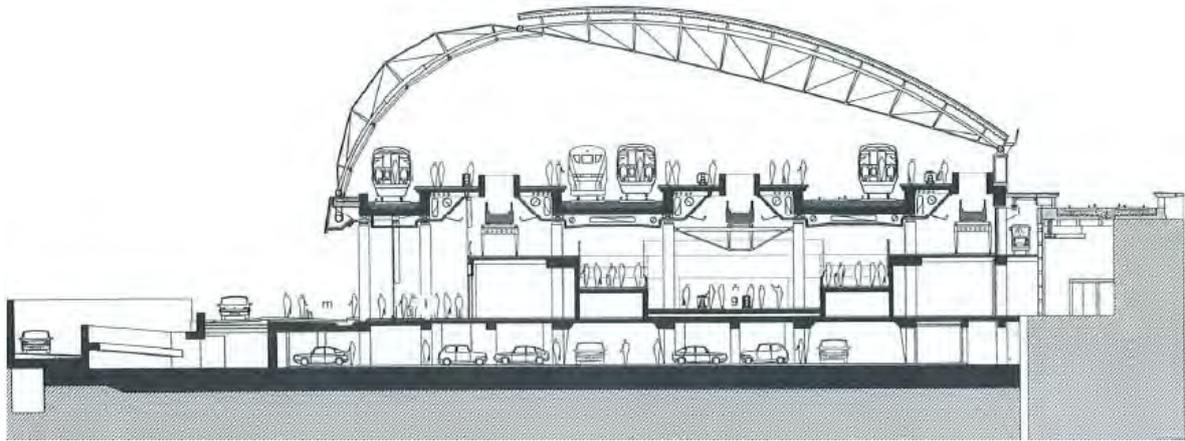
A section through the circulation areas in Waterloo Station. Notice the structural detailing in the design of the roof structure (Davey, 1993: 32).
